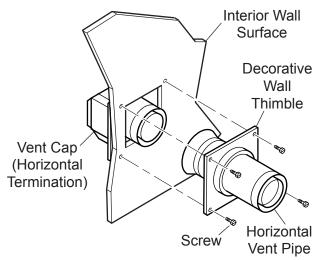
Connecting Vent Cap with Horizontal Vent Pipe
